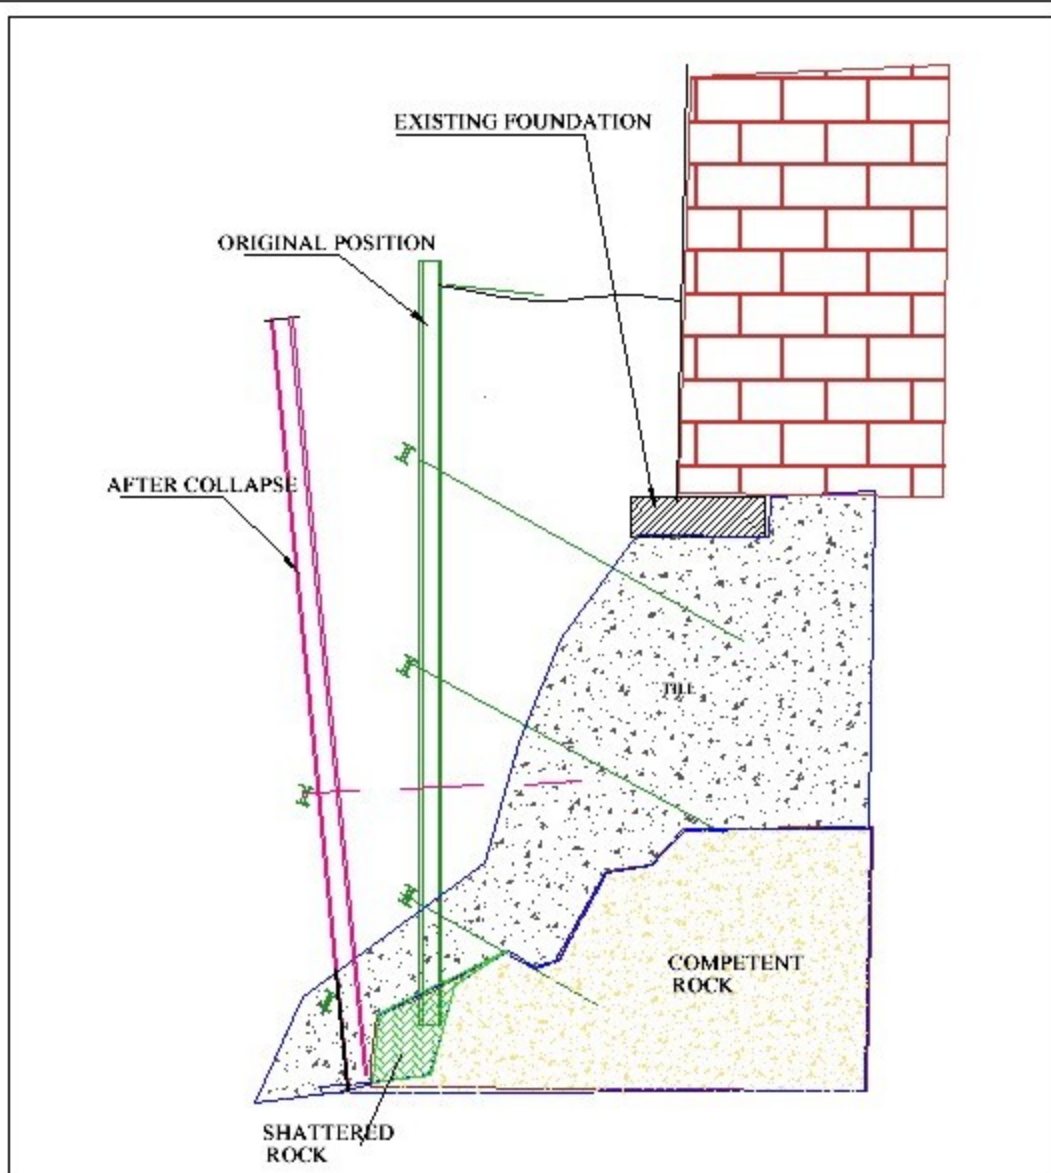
Rendering Section Looking East –Sheeting before and after collapse.
